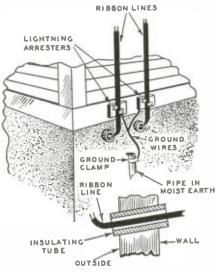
Use an insulating tube to pass the ribbon line through an outer wall.
